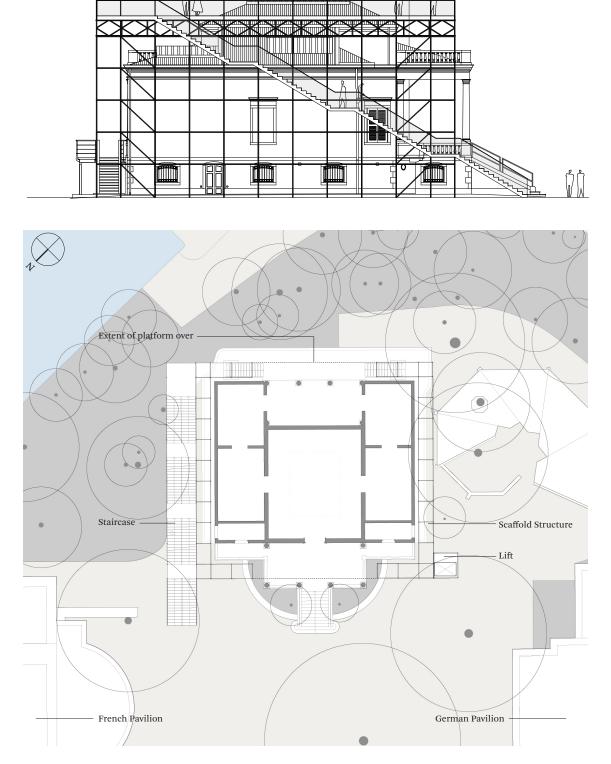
East elevation showing the stair to the platform. Image: Caruso St John Architects.
